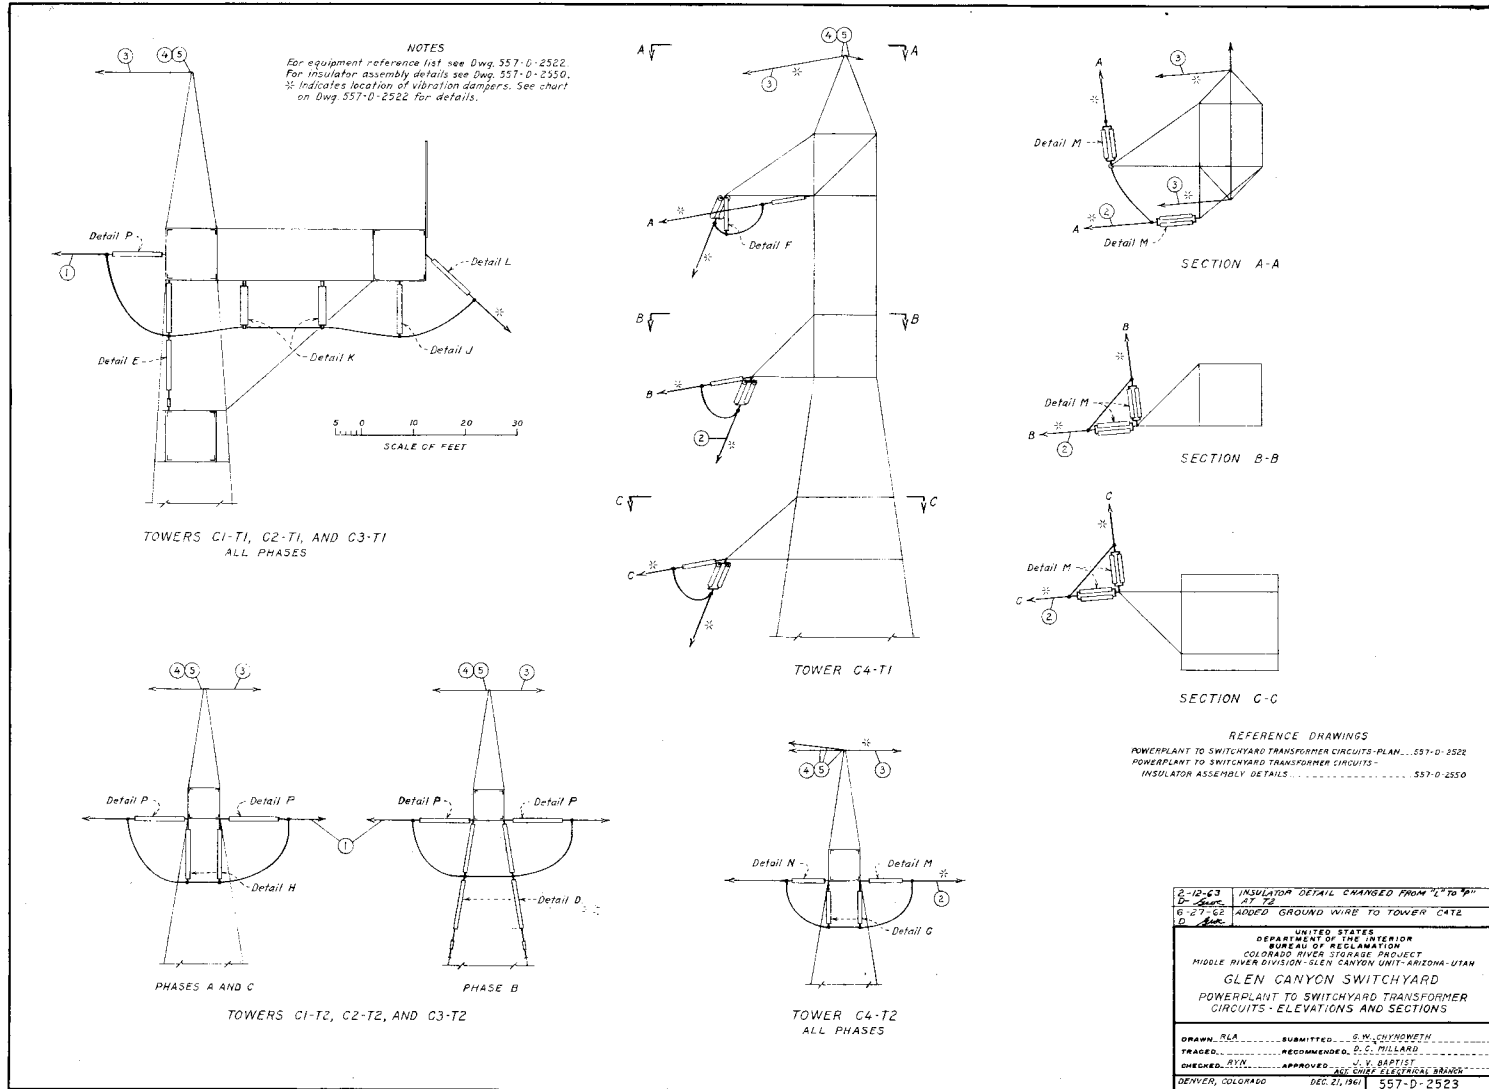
Powerplant to switchyard transformer circuits—Elevations and sections.
